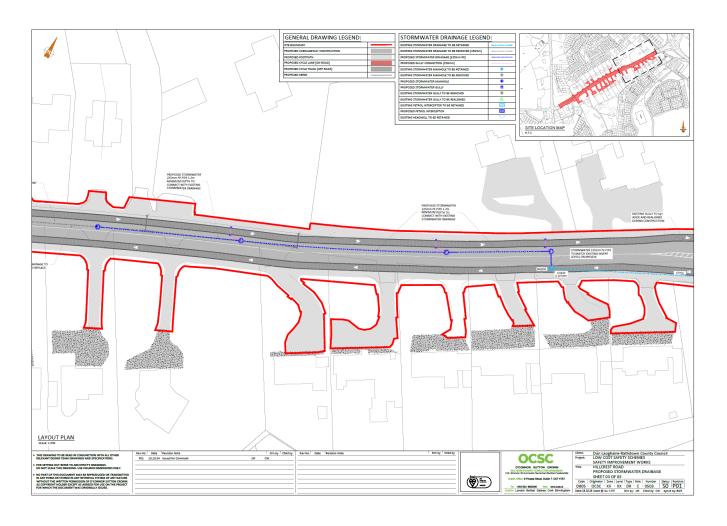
Hillcrest Road Proposed Stormwater Drainage Section C-0503
